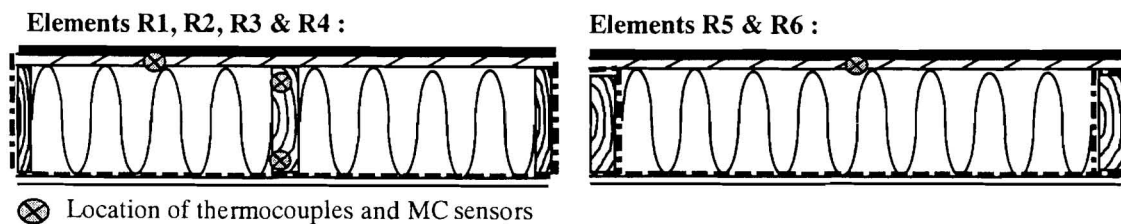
Measurement points in the roof sections, in wooden beams and plywood layer.
